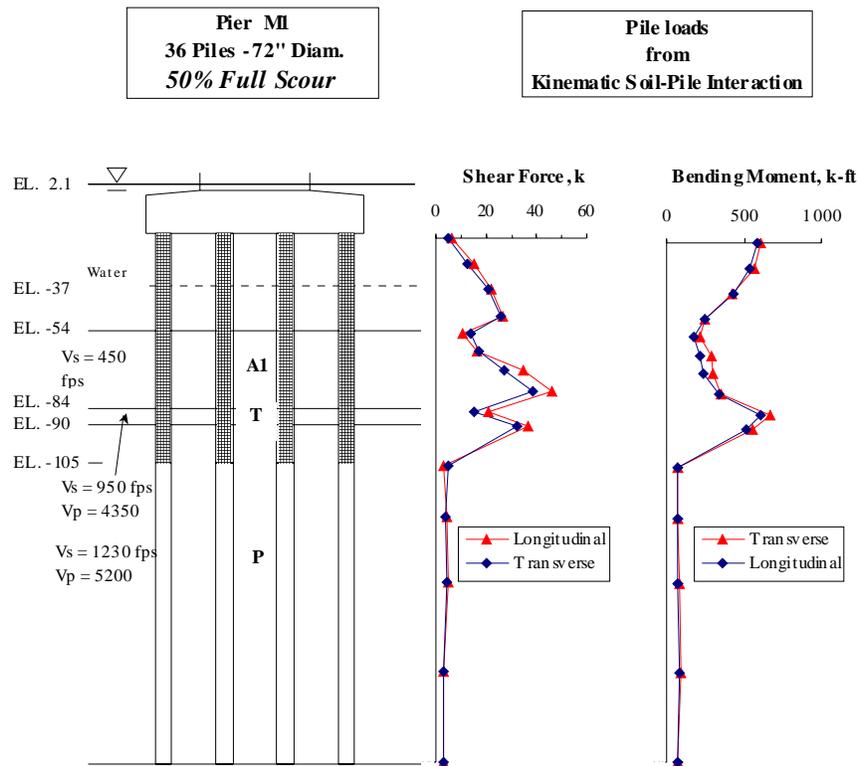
Soil and foundation details for bascule Pier M1, and results of 3-D SSI analysis.
